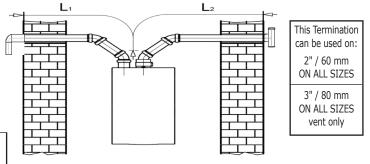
2"/60 mm & 3"/80 mm Twin Pipe Separated Horizontal Flue Termination
